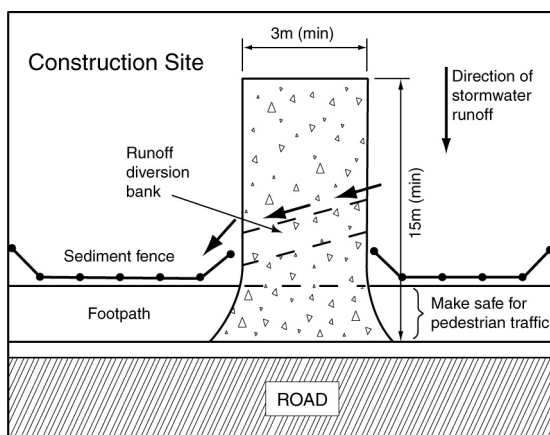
Example of stormwater runoff directed off a *Construction Exit
